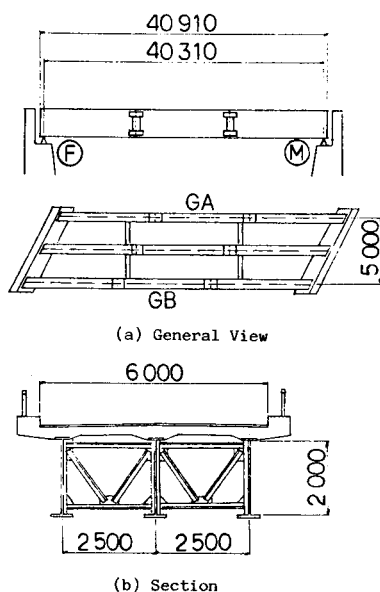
A Composite Girder Bridge of Deck Type (TYPE-2).
